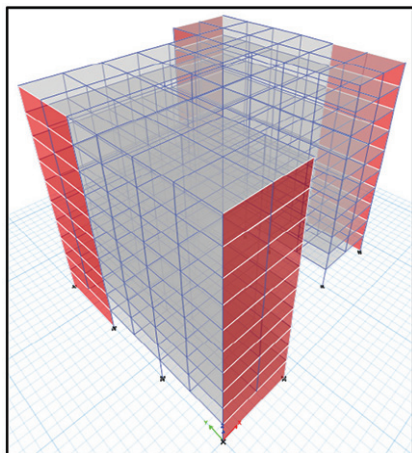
Irregular model with floating column and shear wall at Type-1 location – A7
